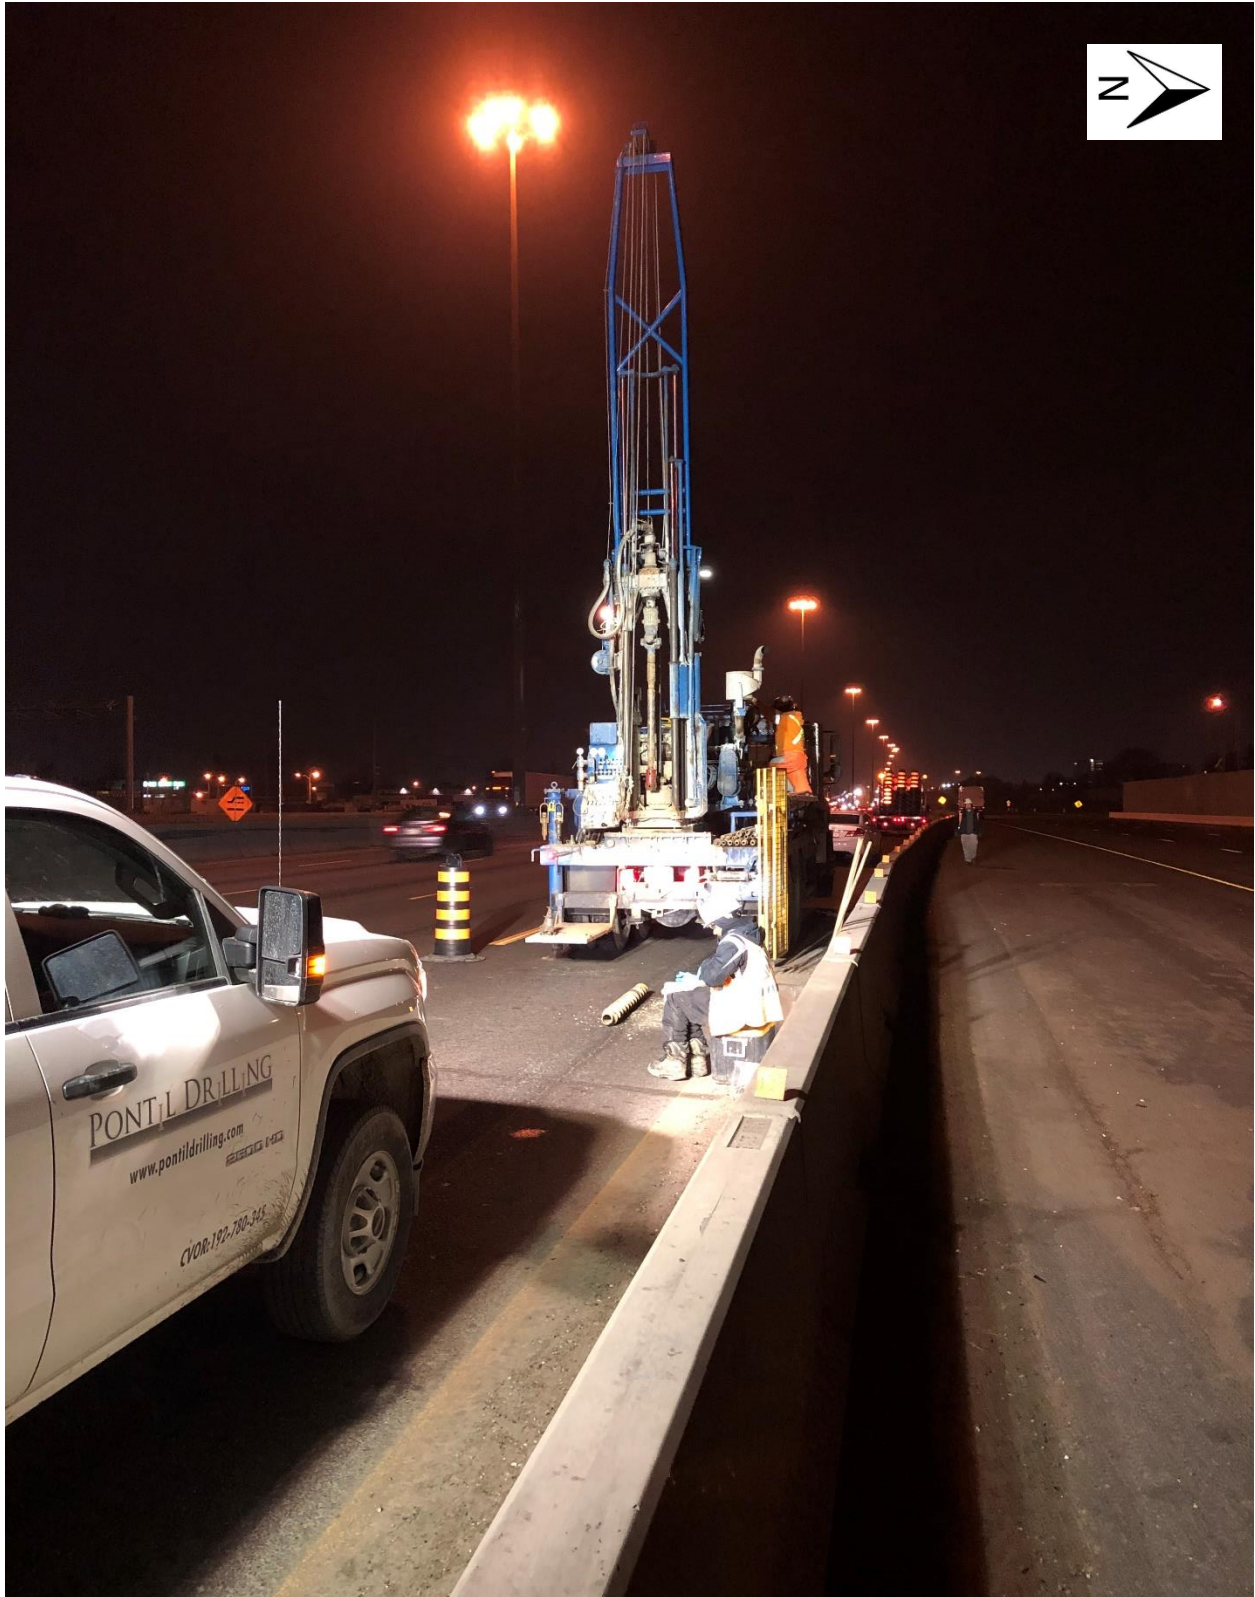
Looking towards West at Dufferin street Overpass on Highway 401 WB Express. – Traffic Control Set-up (November 2019)
